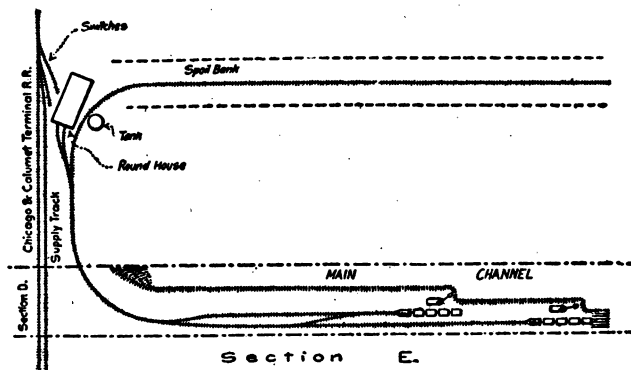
Arrangement of Track on Chicago Drainage Canal Work.
